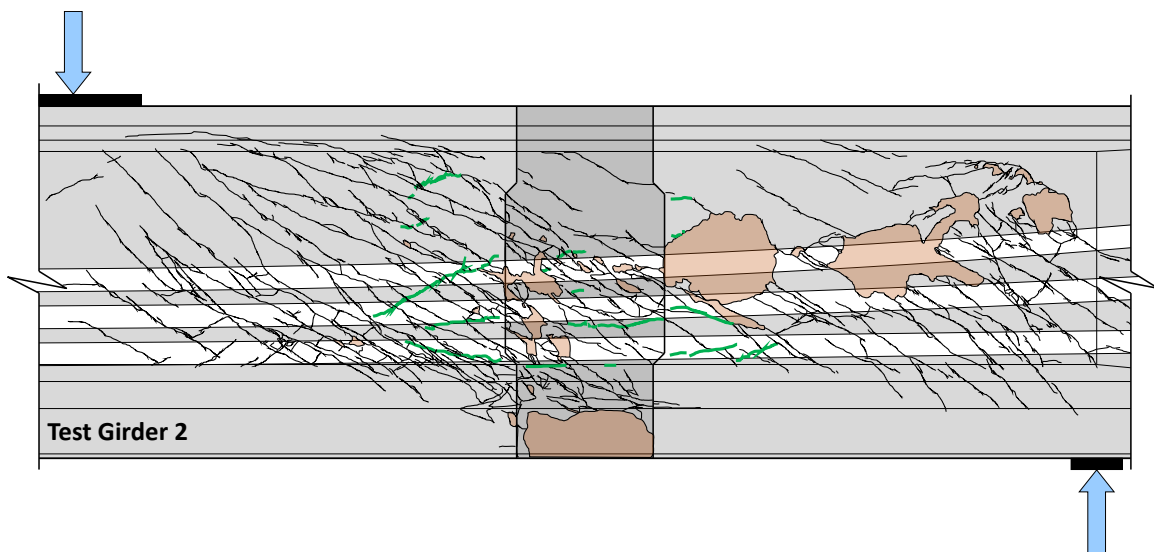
Crack pattern after failure – Test Girder 2
